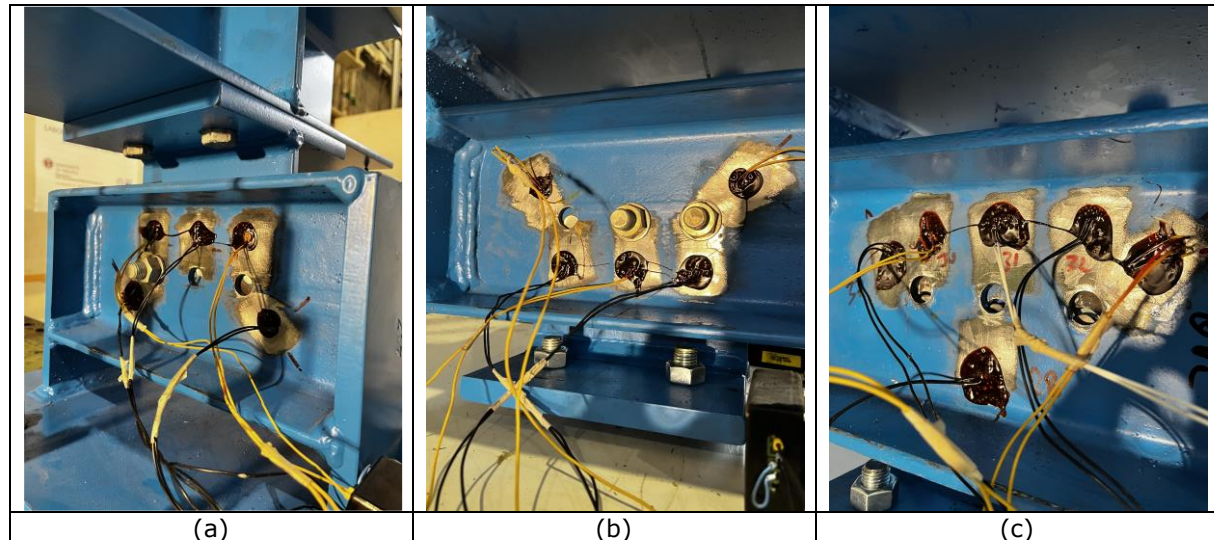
Detail 3.1 at failure: (a) frontal view of aluminium bolts under tension force; (b) frontal view of aluminium bolts under compression force; (c) movement between UPN160 elements and T plate elements after cyclic test.
